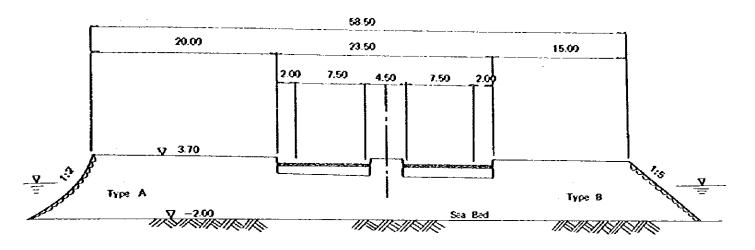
TUPICAL CROSS-SECTION OF THE ROAD
